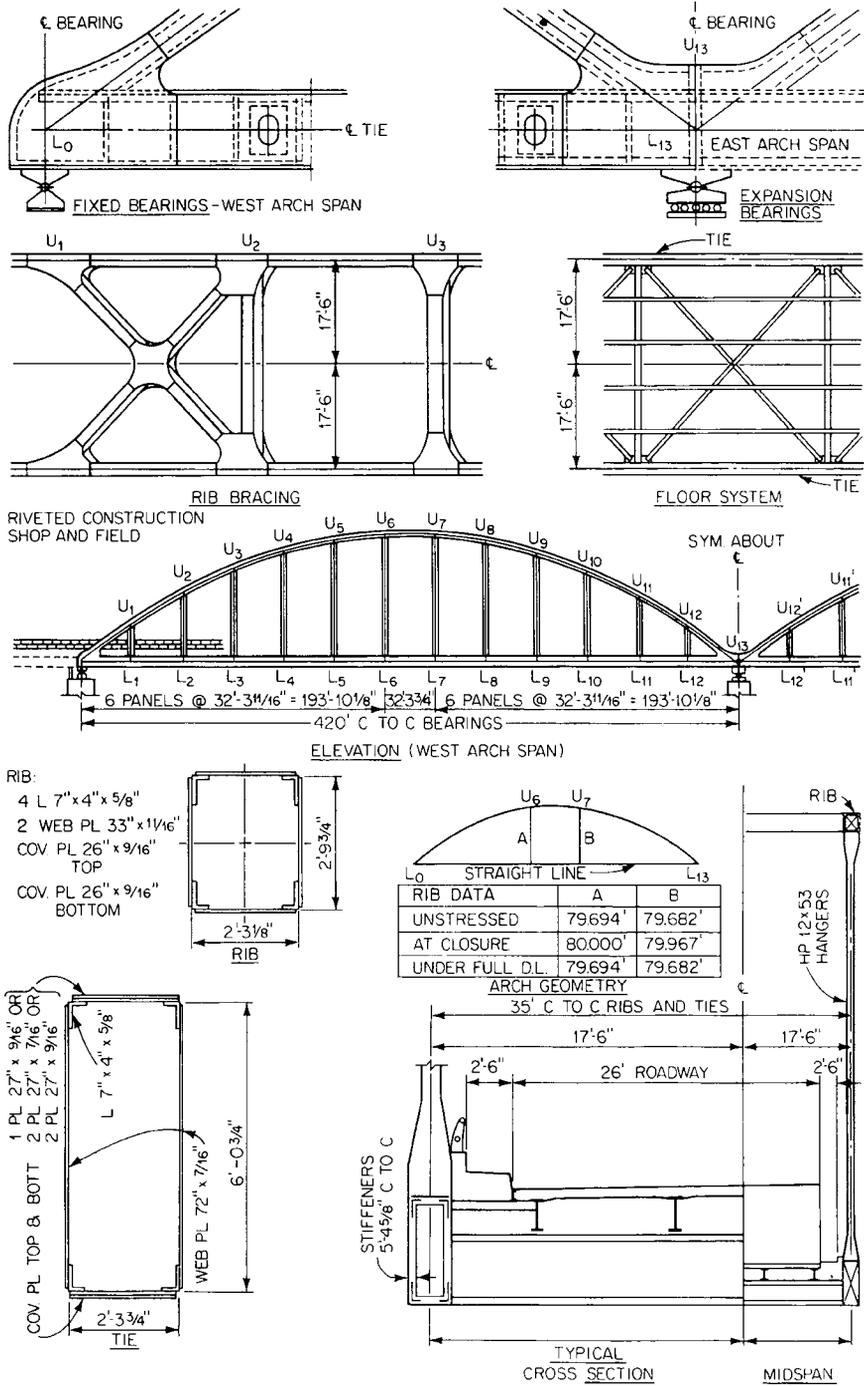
Details of Leavenworth Centennial Bridge.
